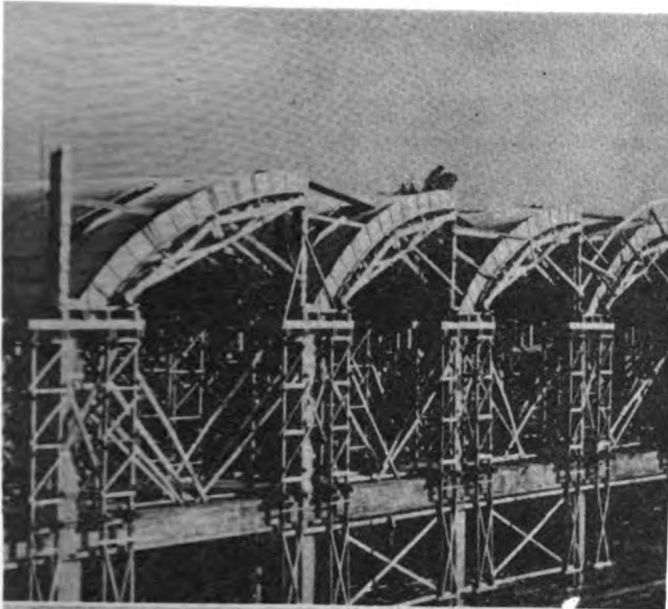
Bldg. I - View looking north. Construction was completed in 1939. It is of concrete frame curtain walls. It has the curved type skylight.
